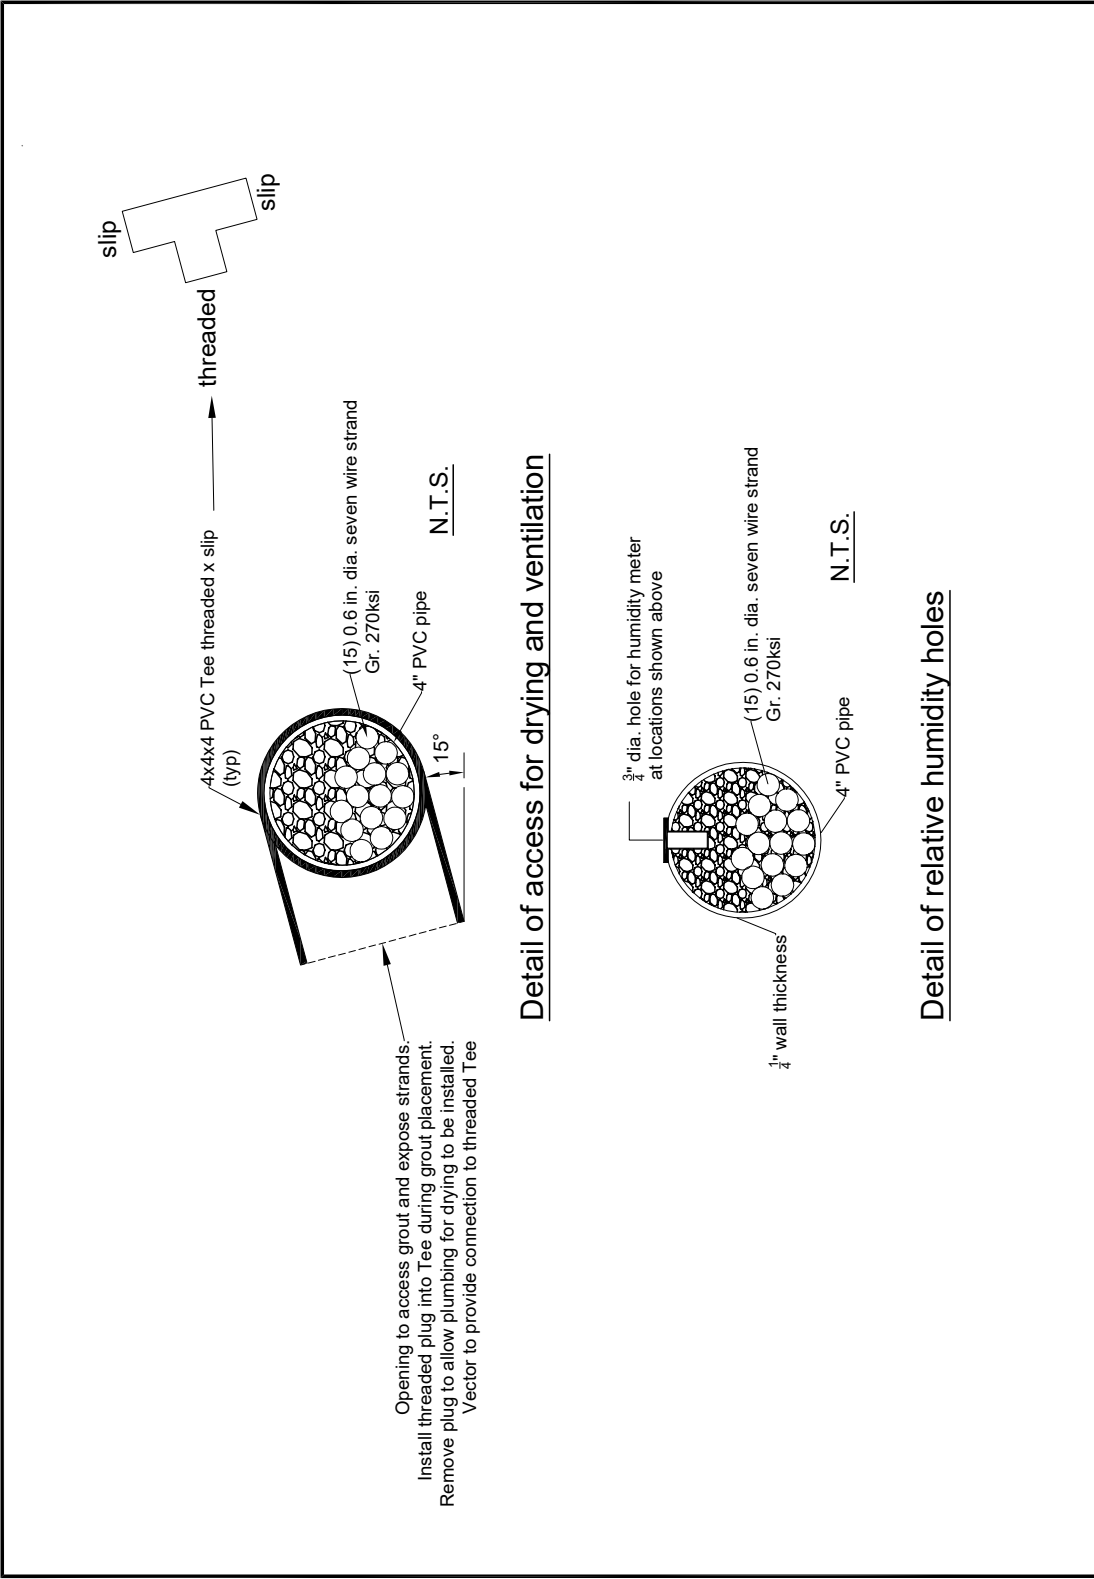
Drying of PVC specimens: details of key cross-section
